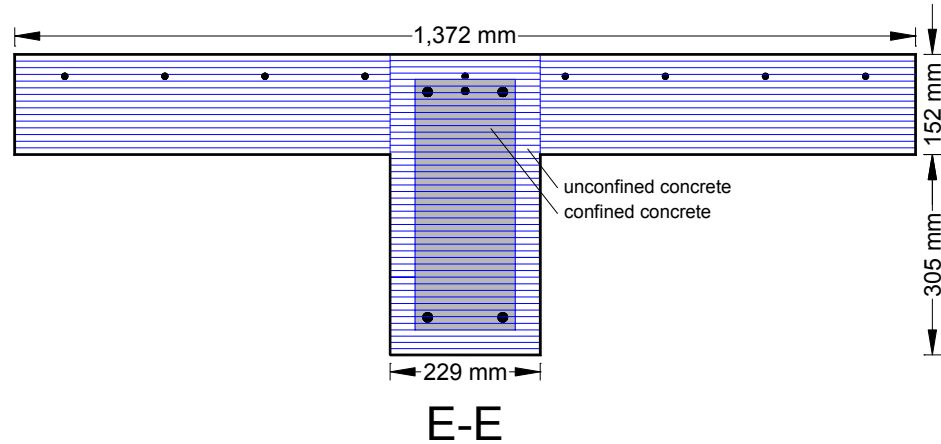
Discretization of beam sections (1 in. = 25.4 mm).
